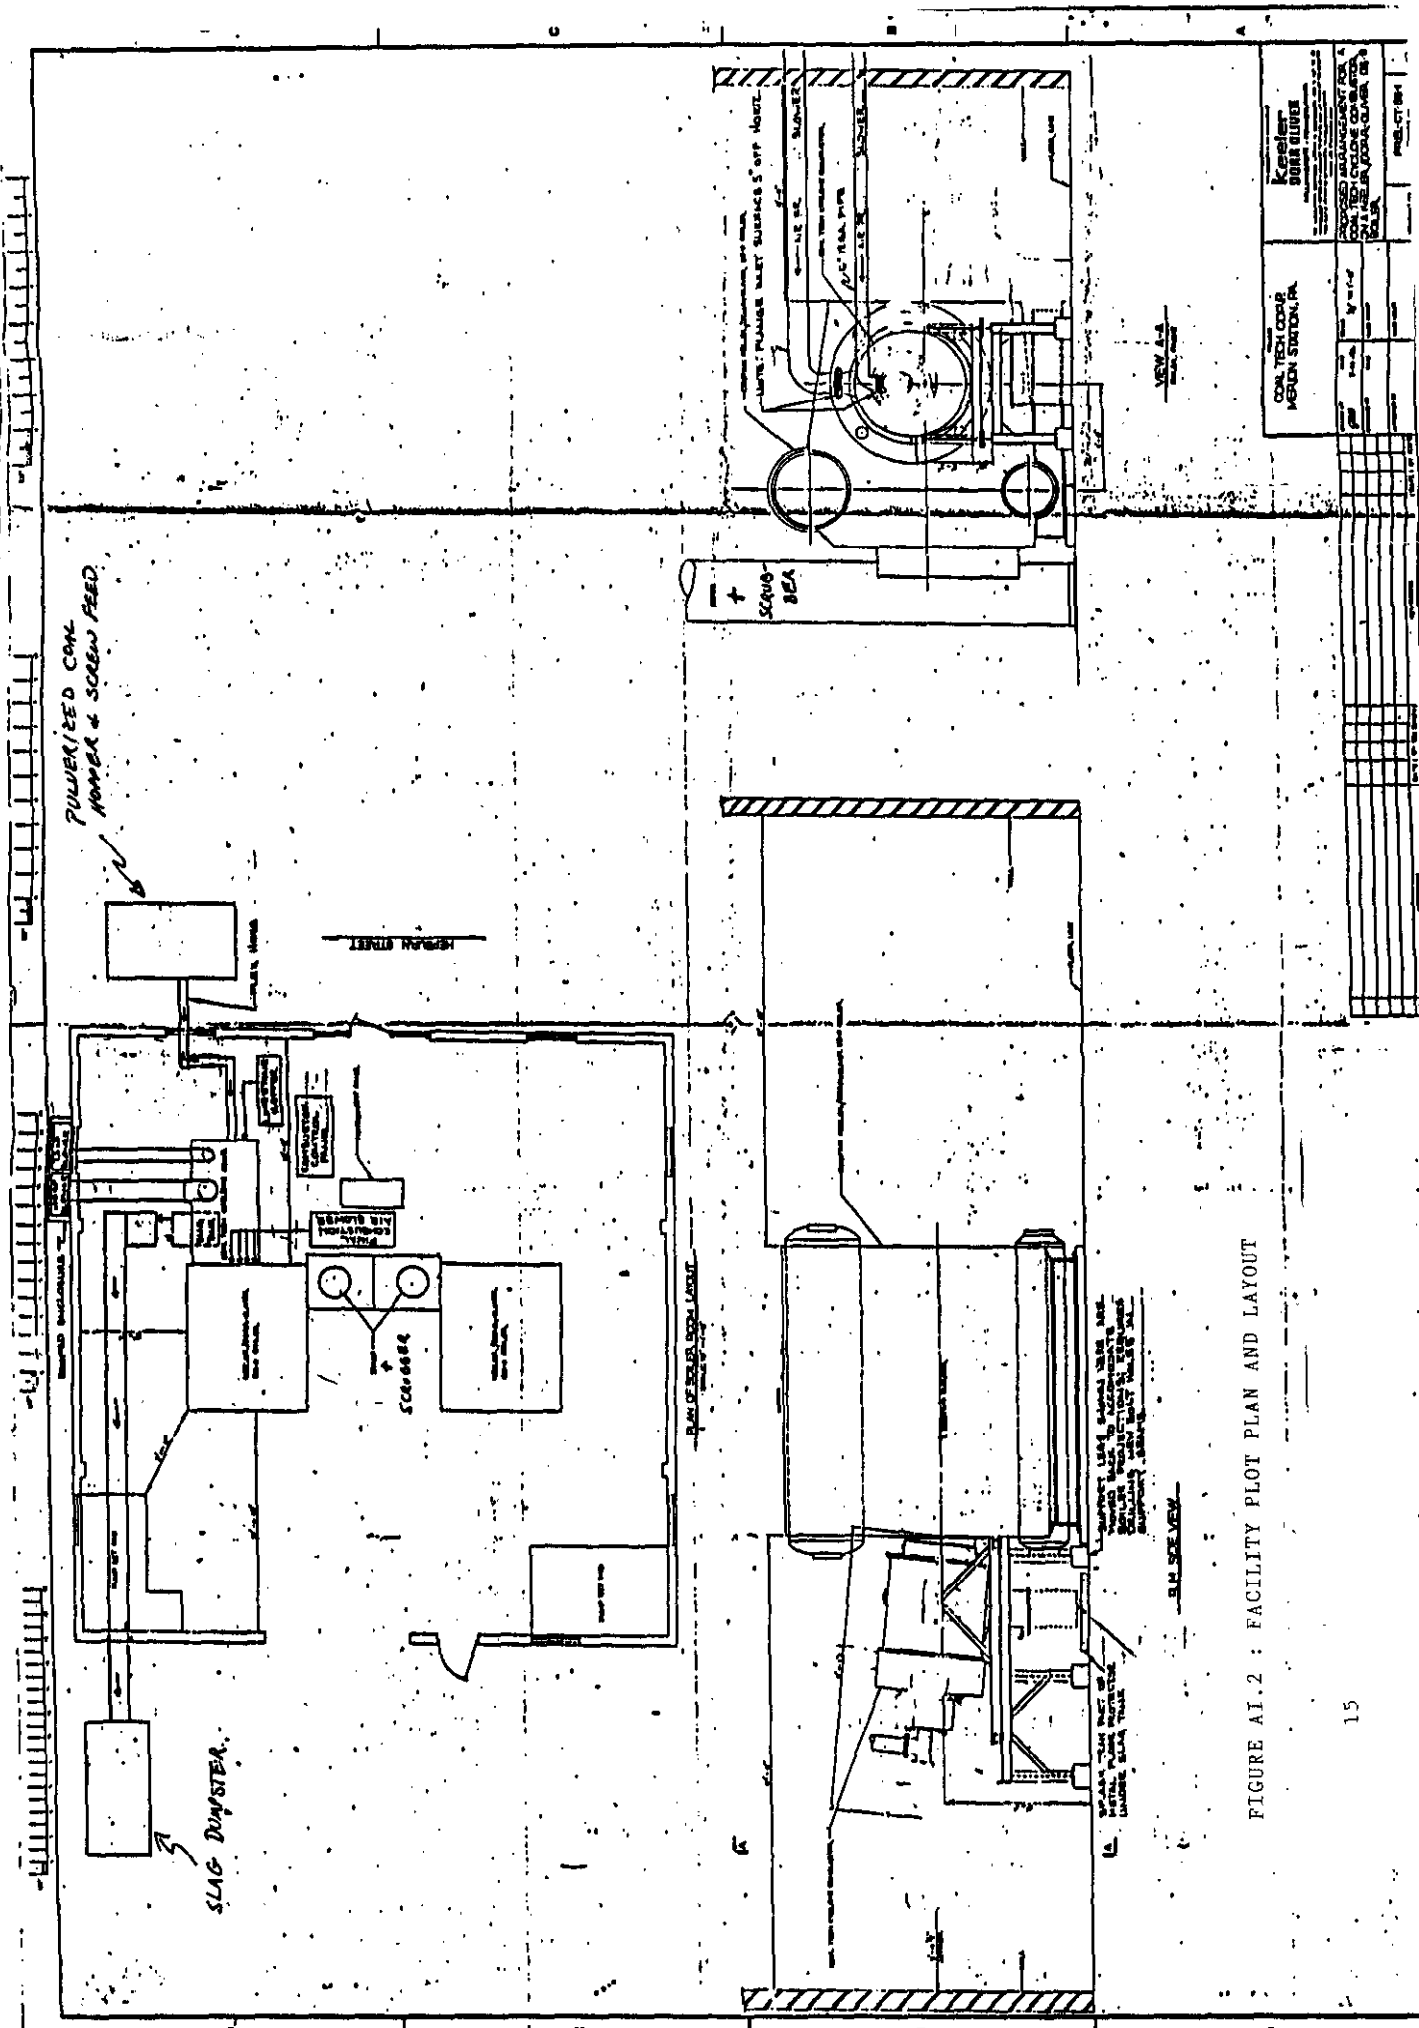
FACILITY PLOT PLAN AND LAYOUT
